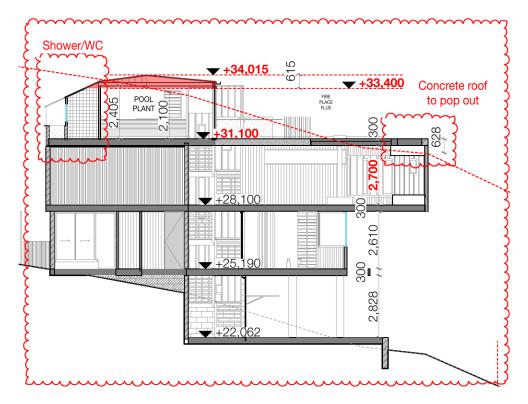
Extract of Section 01 illustrating the proposed breaches of the 9m building height standard.
